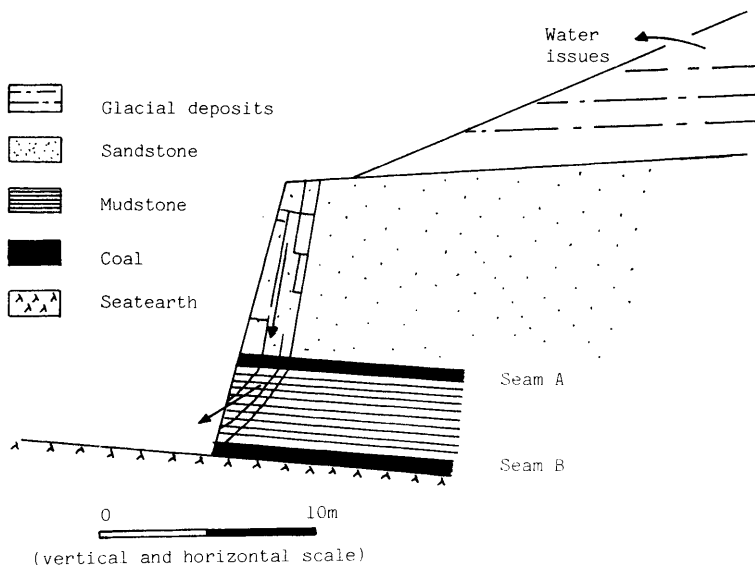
Highwall Instability at an opencast coal site (After Cobb 1981)
